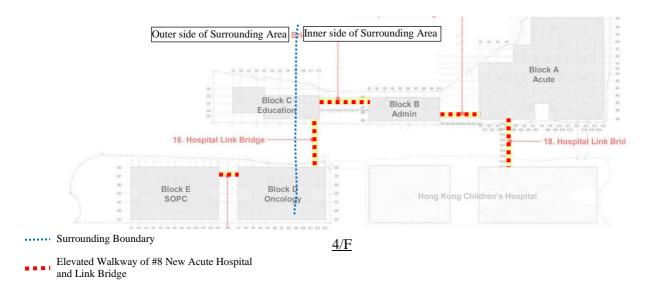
Elevated Structure of #8 New Acute Hospital and Link Bridge (cont.)
